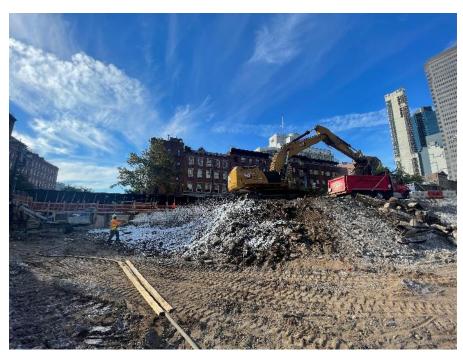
CCJV loading excavated soil/fill for off-site disposal (facing south)
